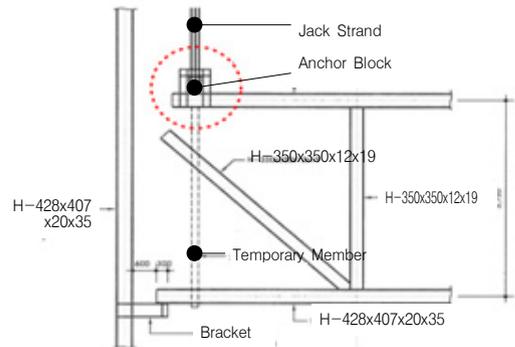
Temporary support detail of truss fabrication work on the 6th roof floor before lift-up
